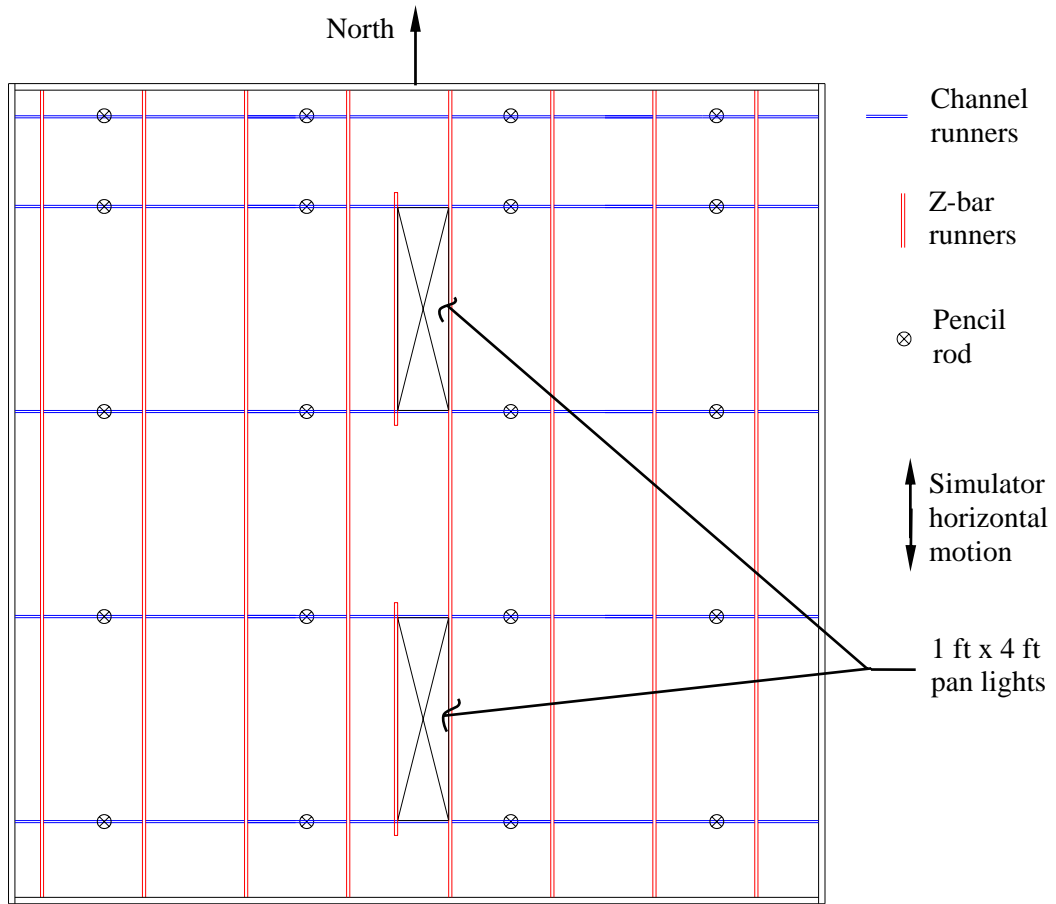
Layout of main supporting members in ceiling system CS1.
